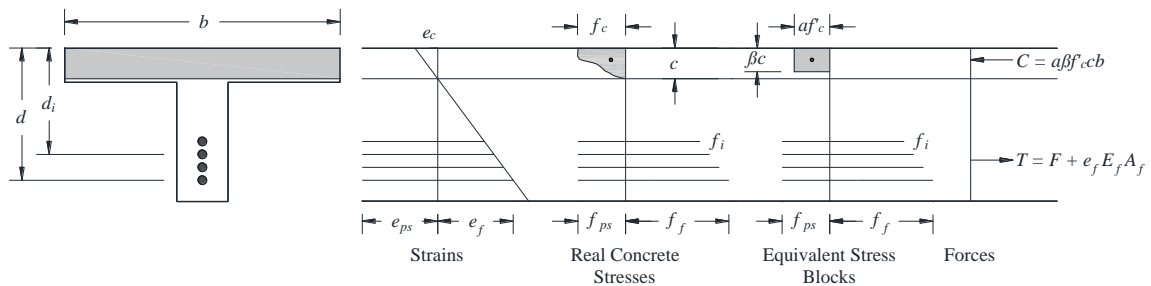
General Solution for a Cracked Prestressed Concrete Section with Linear Elastic Tendons.
